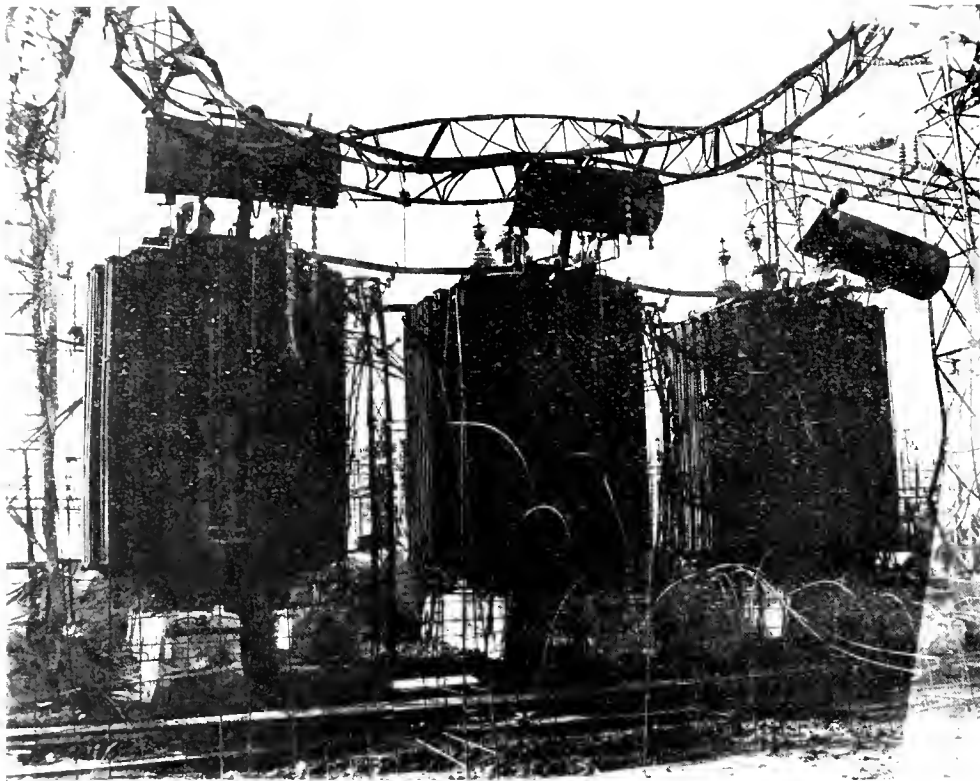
Another view of nearest bank shown in photo 2—reinforcing rods for protective wall in foreground
